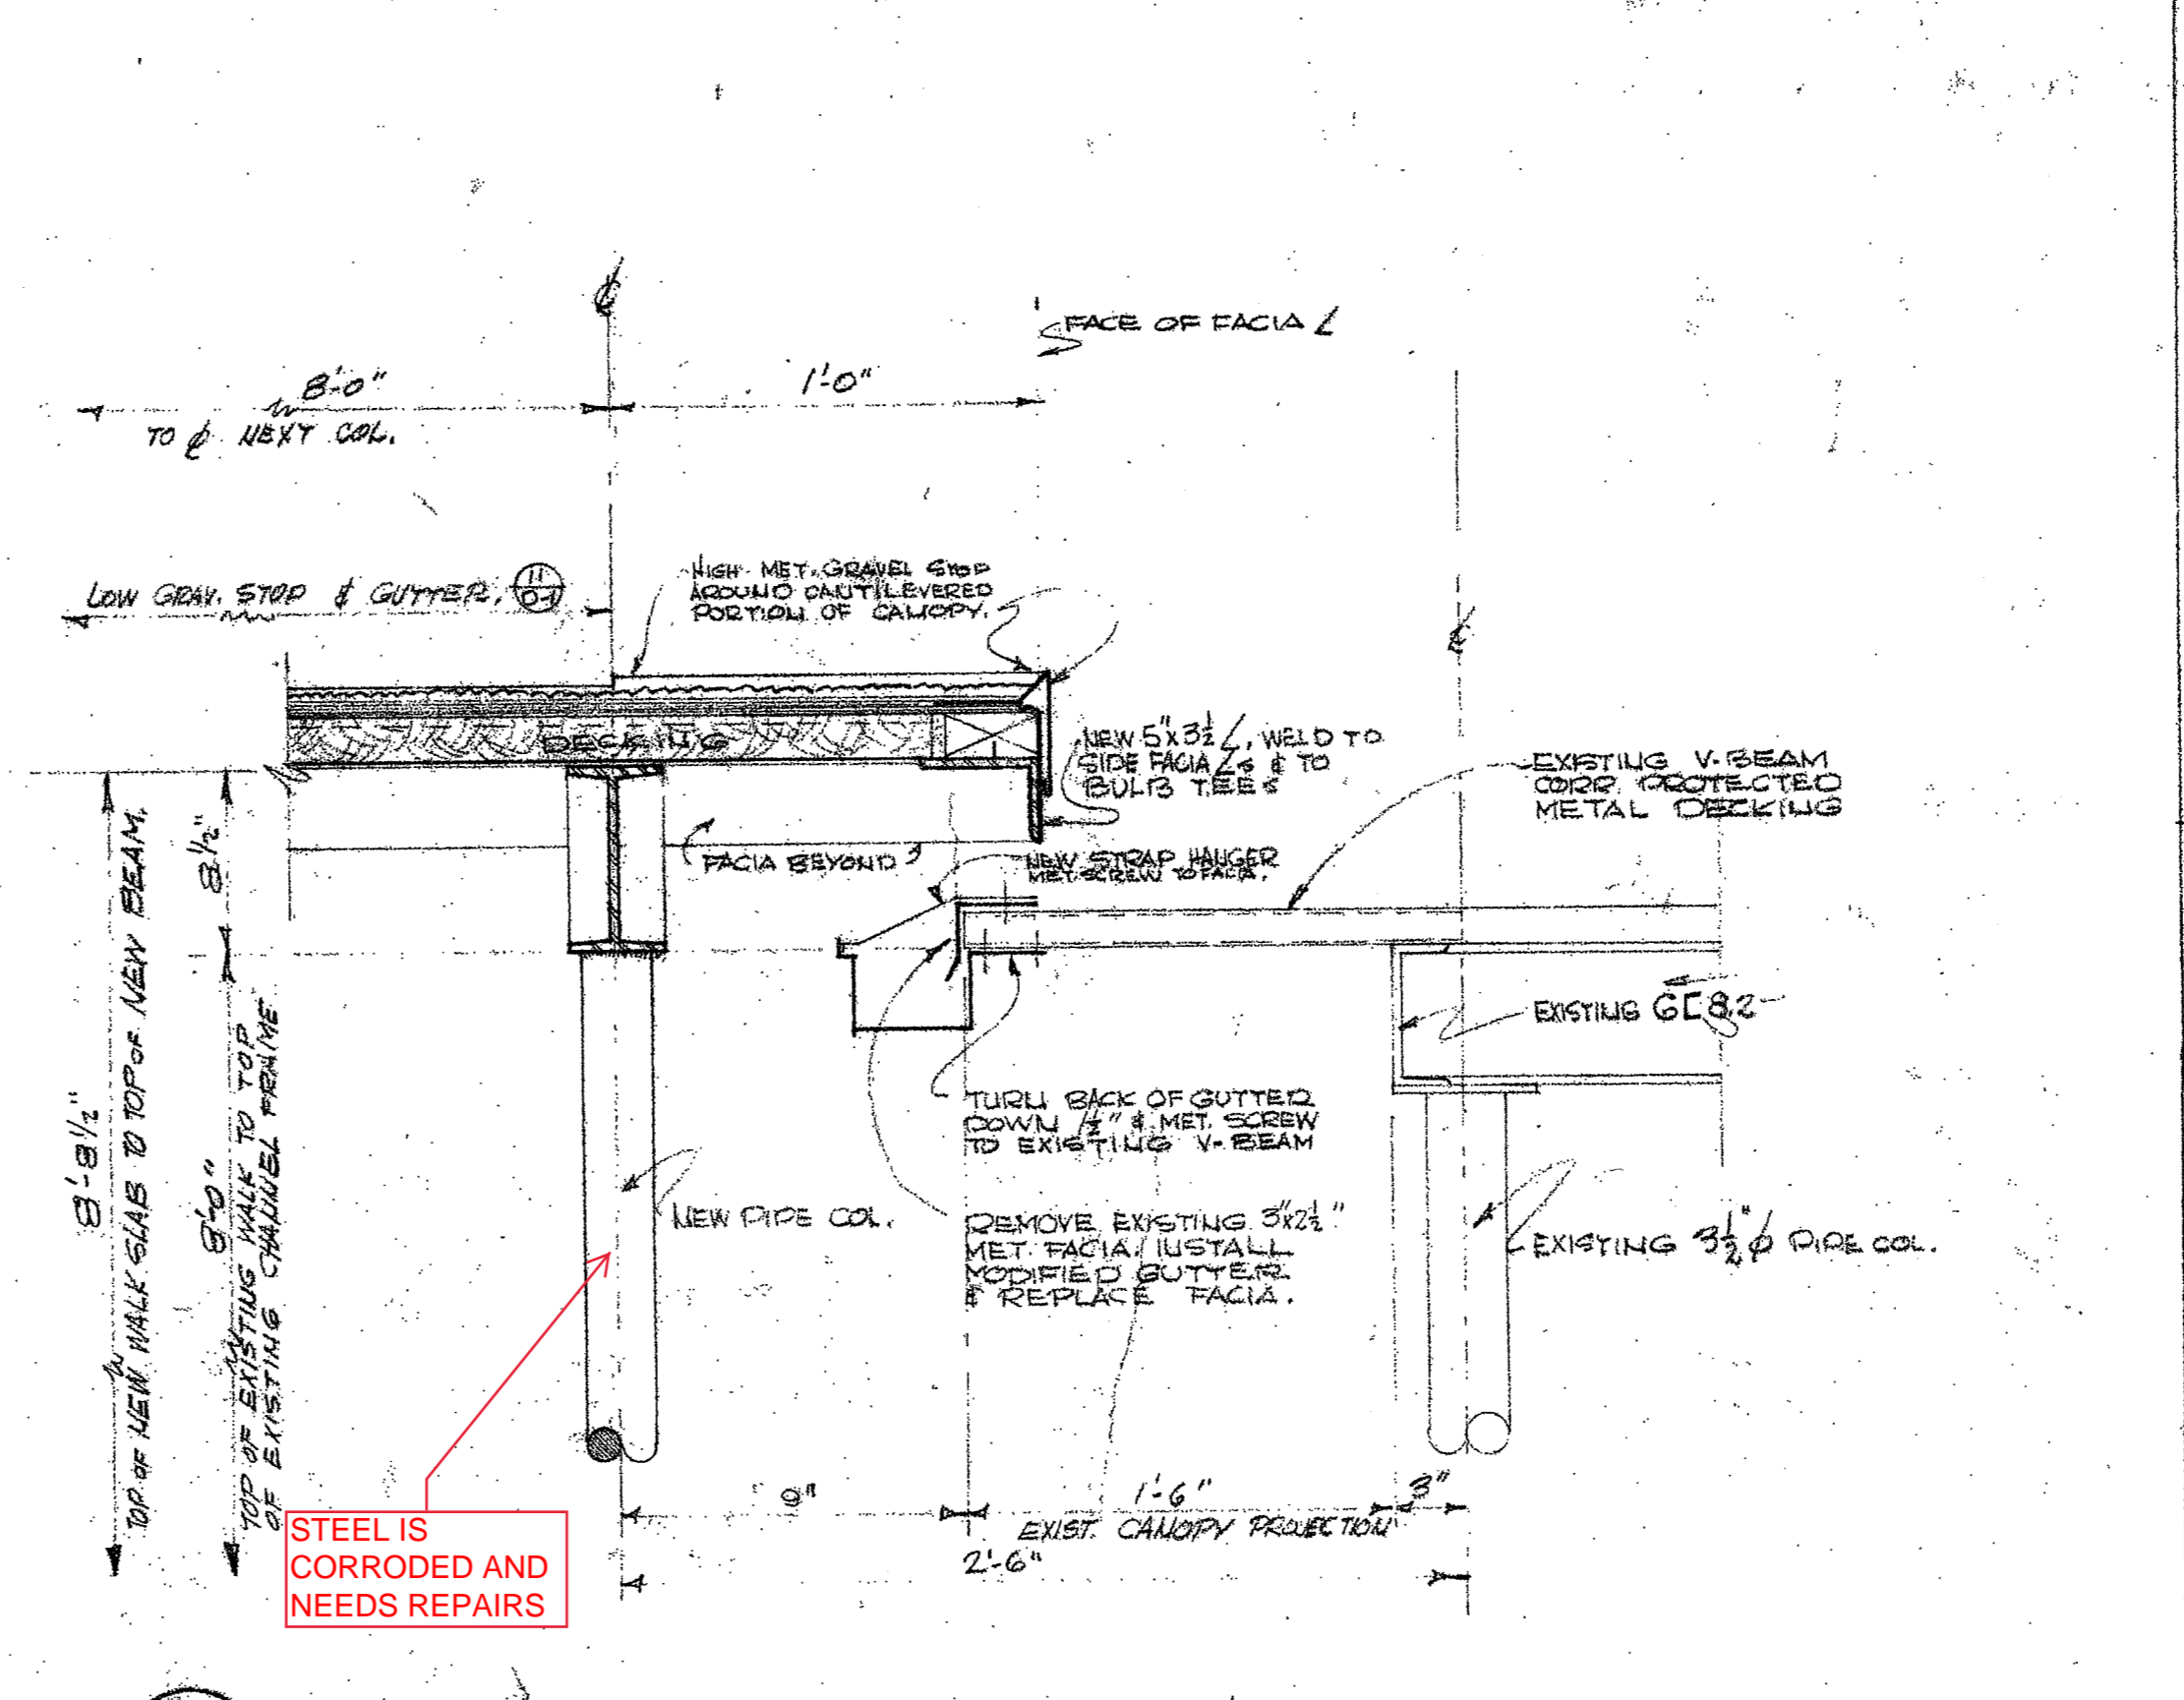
DETAIL SECTION D-3 THROUGH CANOPY @ DOORS NOS. 114 & 137
